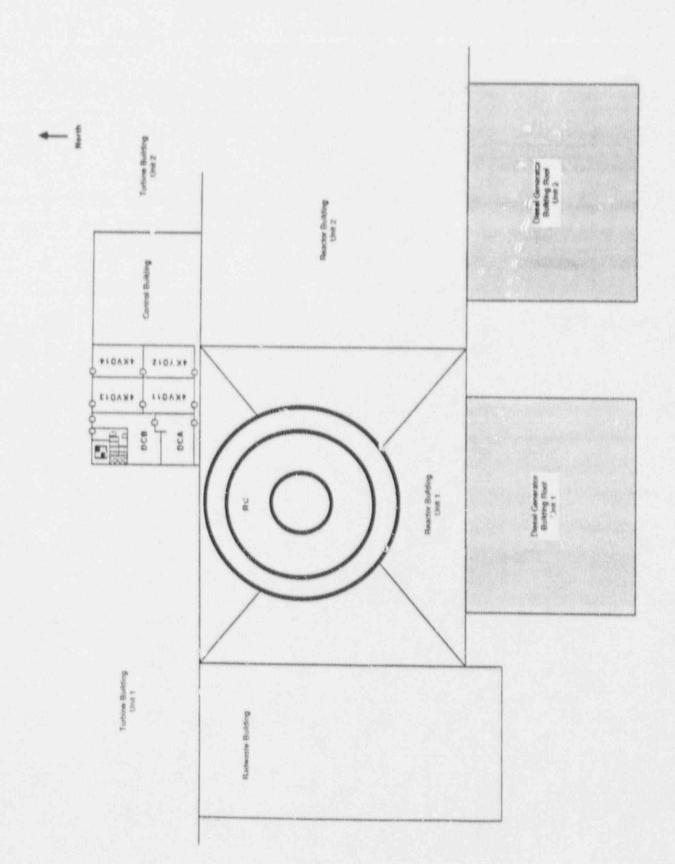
Limerick 1 General Arrangement, Elevation 239"
